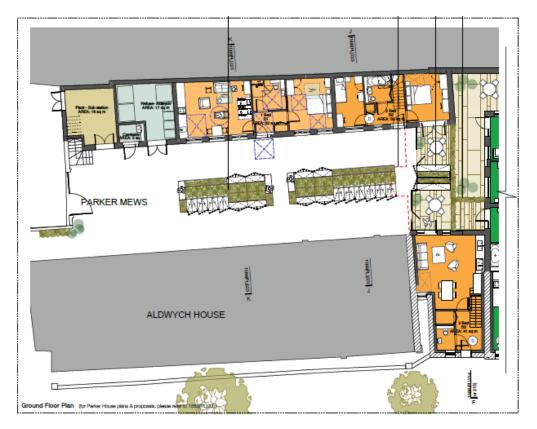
Approved proposed ground floor plan of Aldwych Workshops
